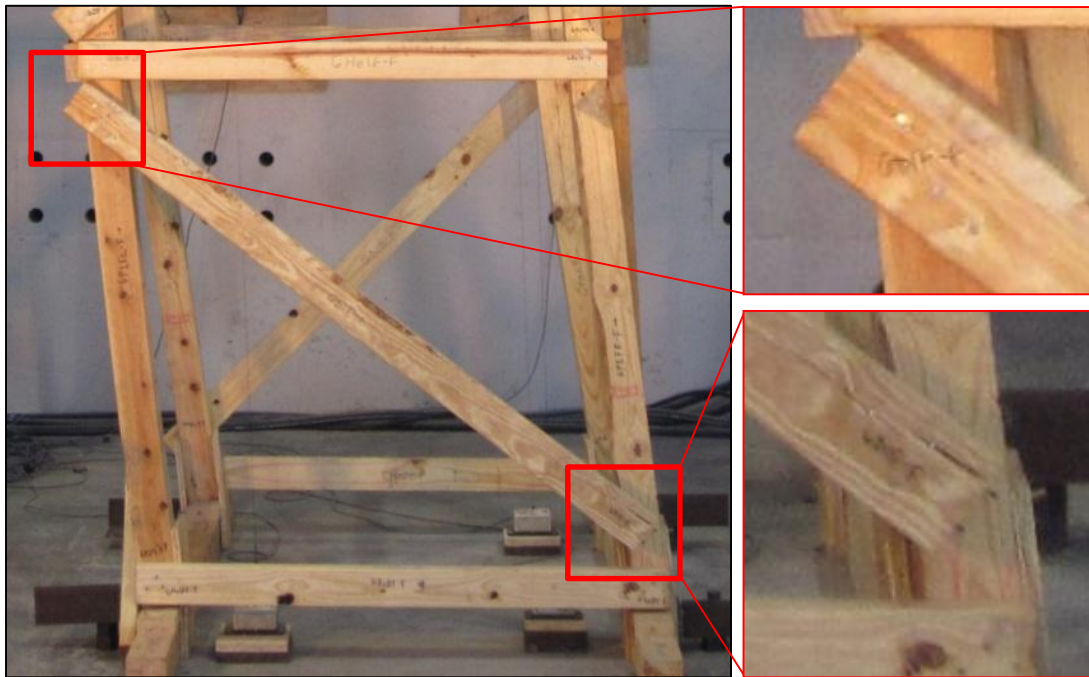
Deformed image of actual nail slip at ground level and first story joint of Shore 6
